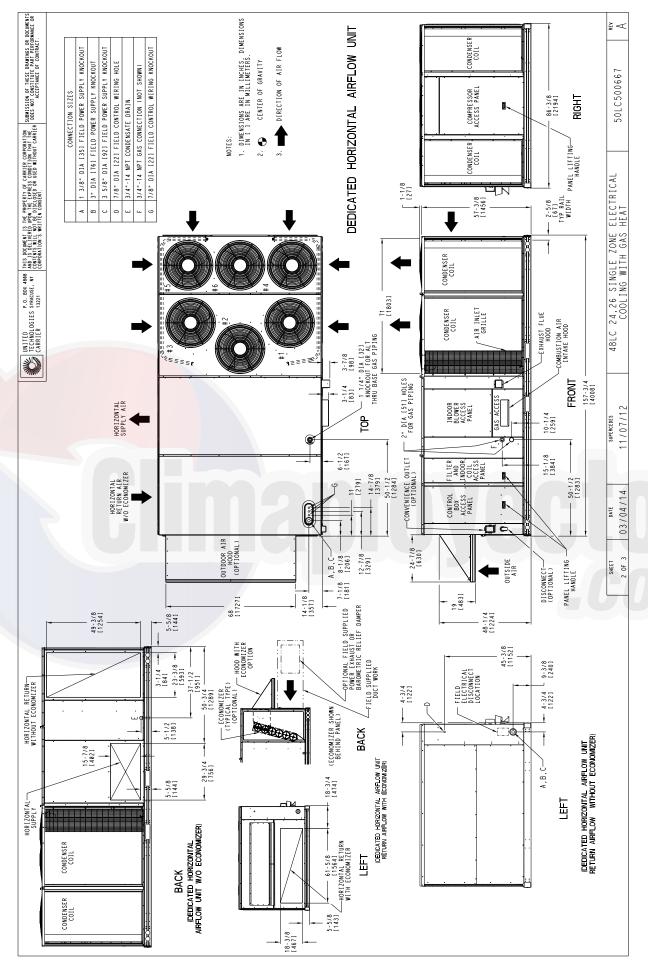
(cont.) - Unit Dimensional Drawing - 24 and 26 Size Units, Sheet 2 of 3
